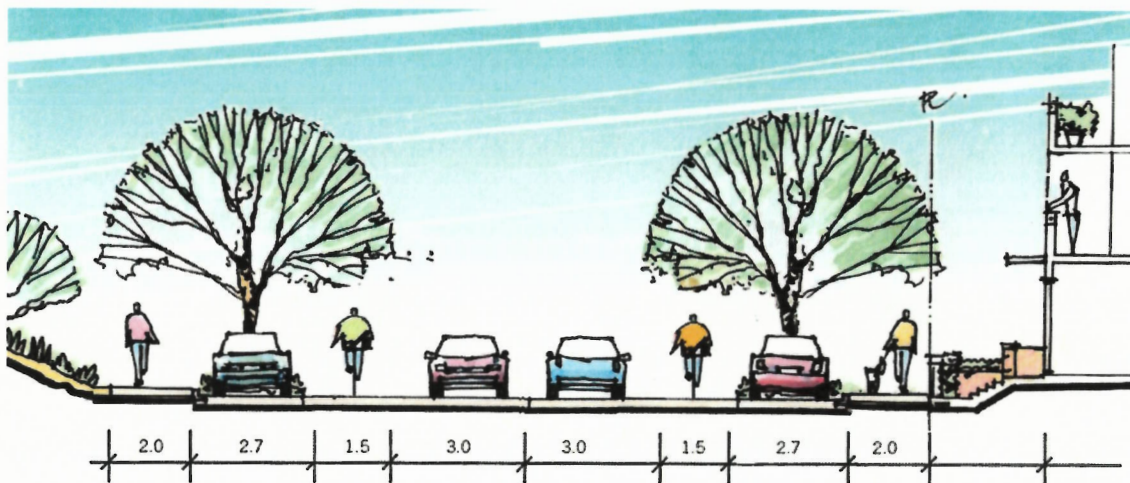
Illustrative Section across Tyee Road (Illustrating minimum streetscape widths)
